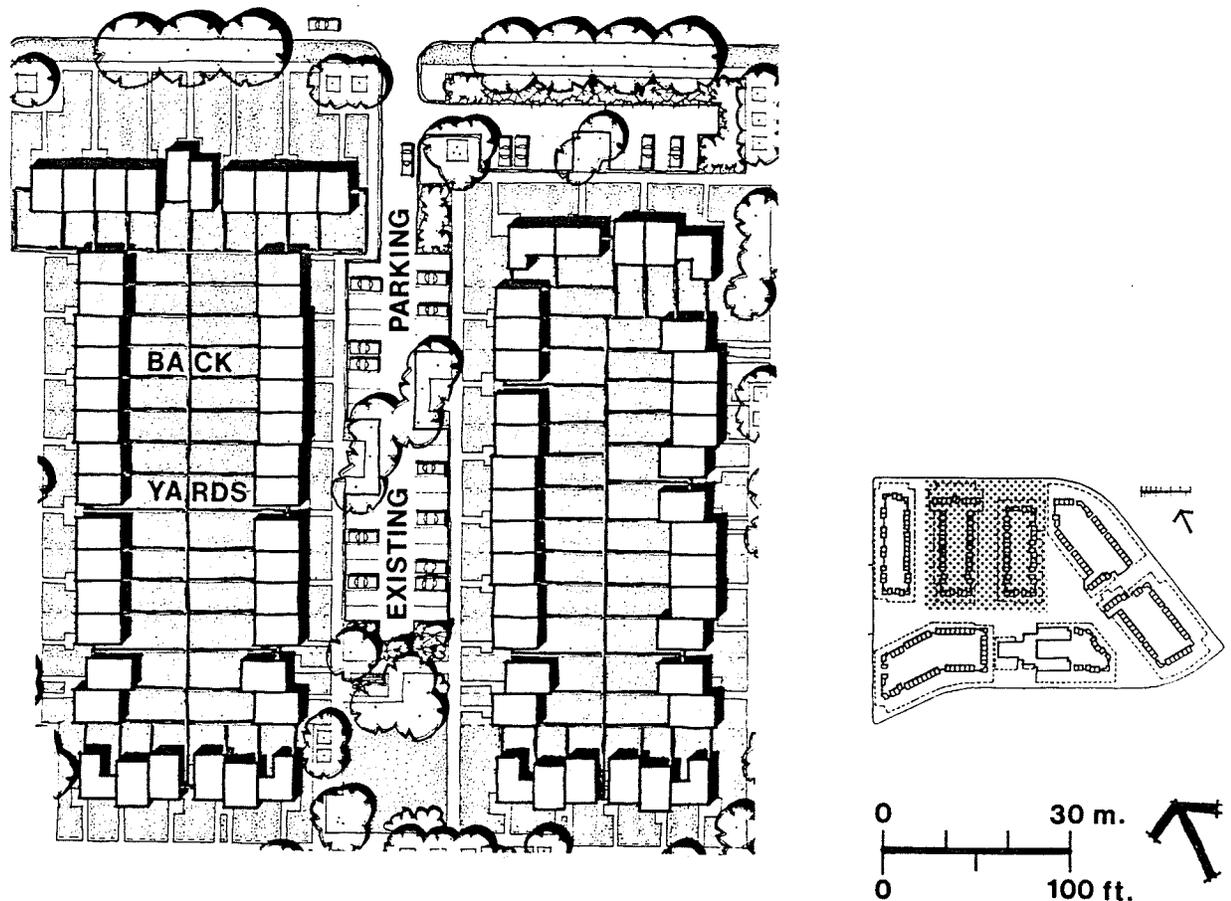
Alternative 3: Re-Development of Existing Parking Lots
